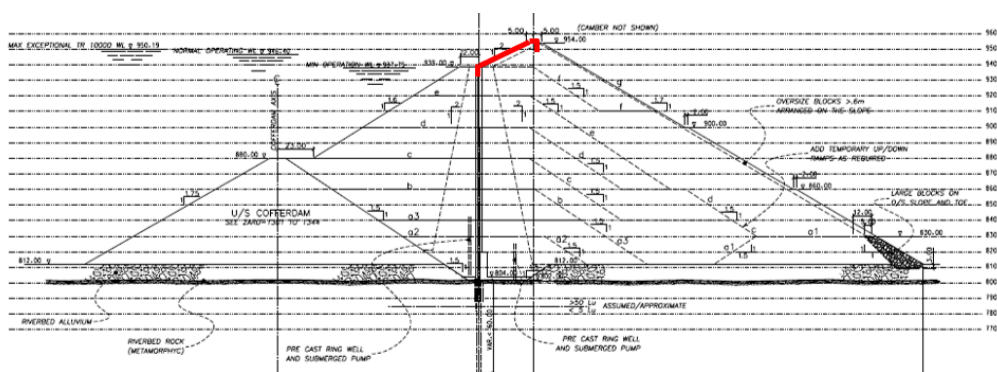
Cross section of Zarema May Day dam: In red, the position of the polymer liner (not to scale)
